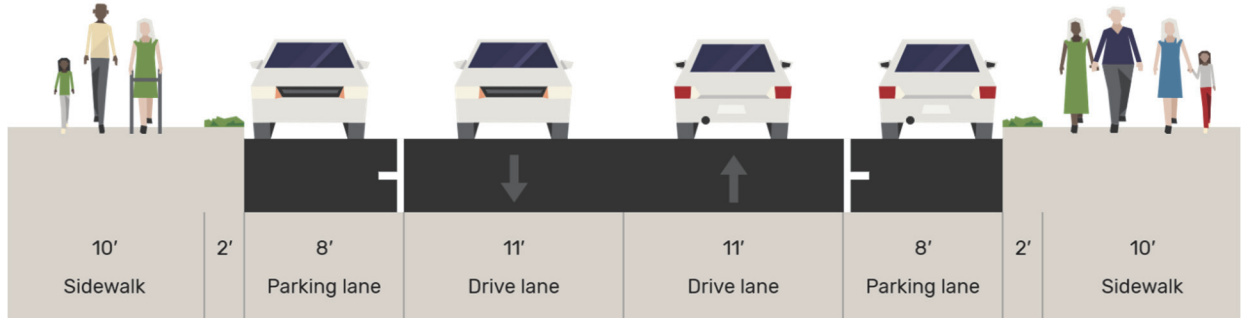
Alternative 3: Ten-Foot Sidewalks with Vegetative/Hardscape Buffer
